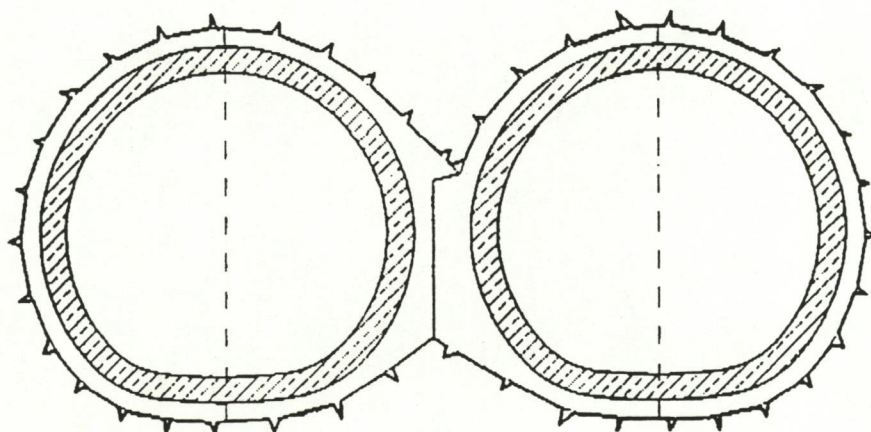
Touching linings / primary lining in first tunnel completed when second tunnel is built
